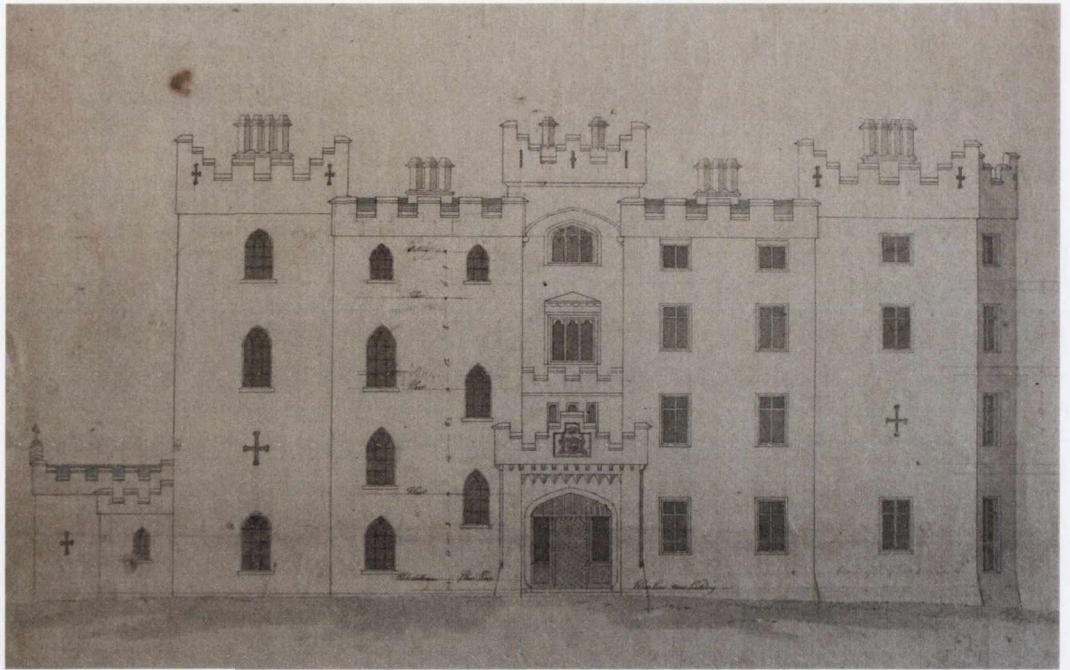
Killeen Castle, proposal second scheme, elevation of principal facade, Francis Johnston, Feb. 1803, IAA, RIAI Murray Collection, 92/46.905, courtesy of the Irish Architectural Archive.
